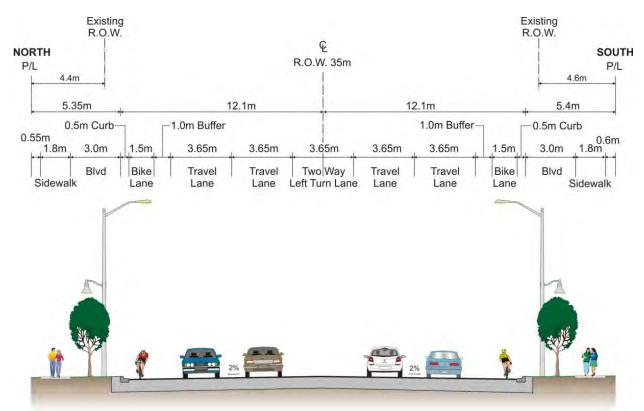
PIC 2 Typical Cross-Section County Road 42 St. Alphonse Avenue to County Road19/Manning Road
